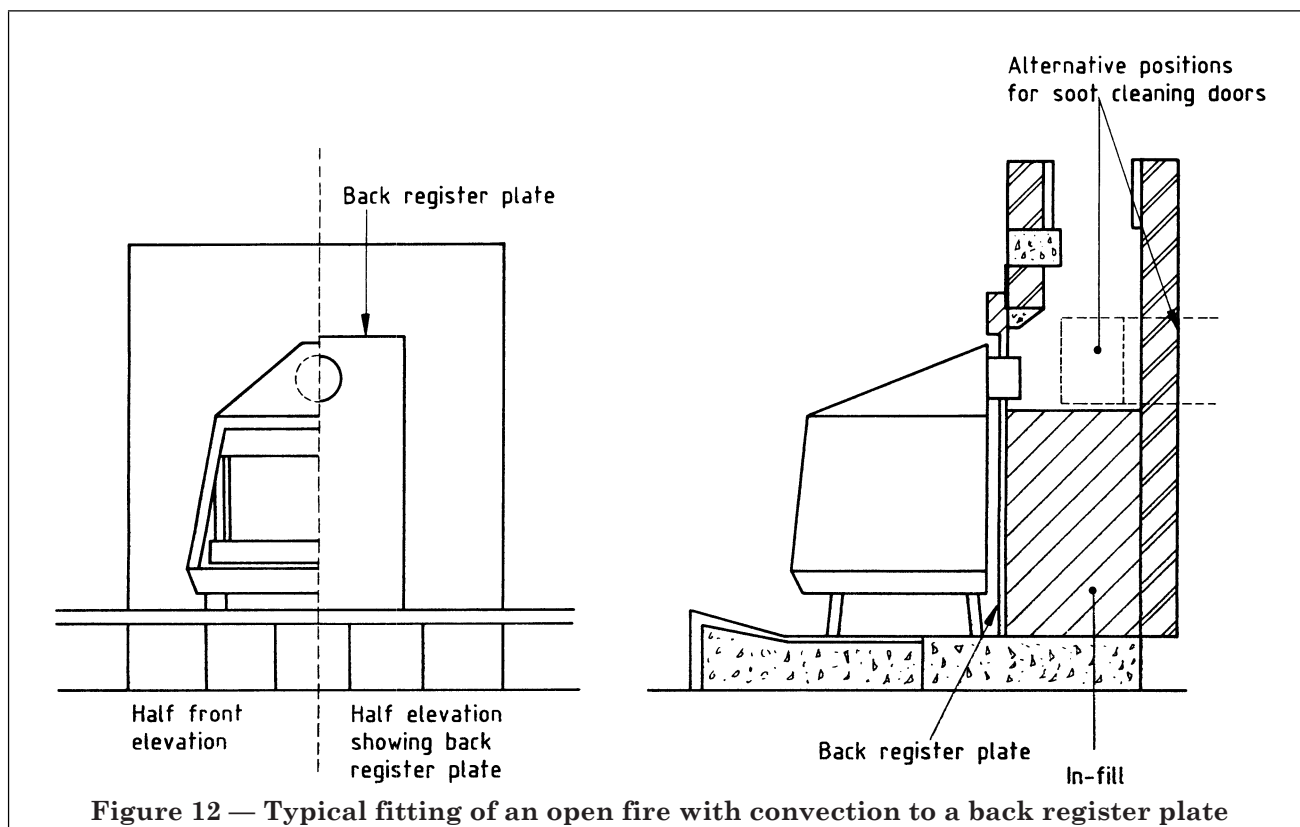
Typical fitting of an open fire with convection to a back register plate
